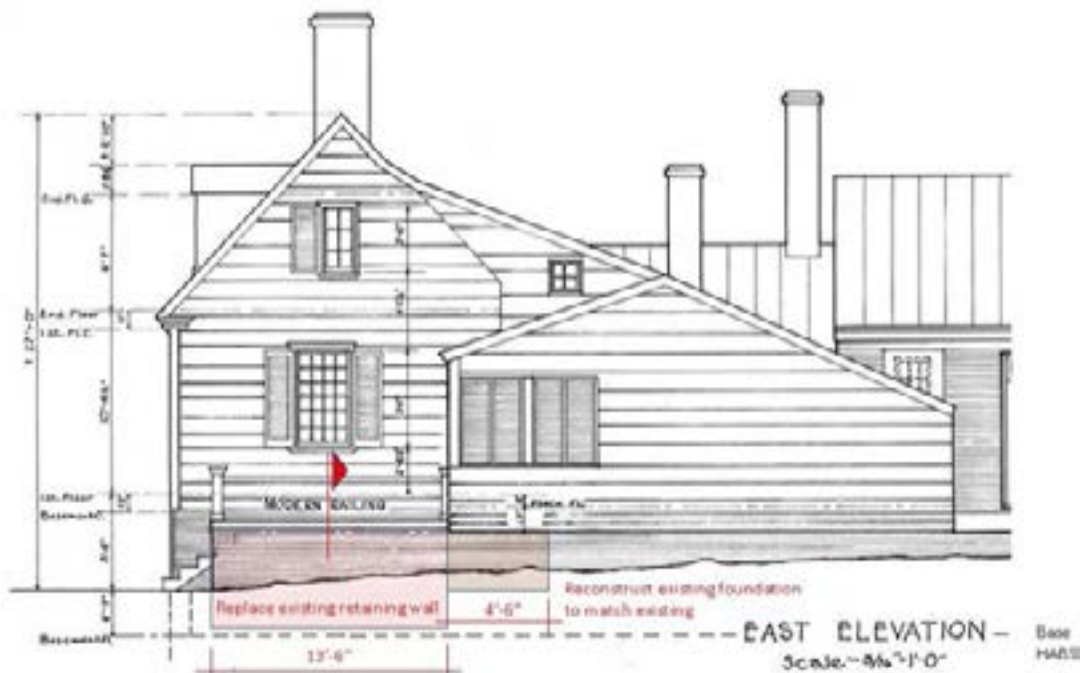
East Elevation showing stoop and porch foundation repairs c2021
